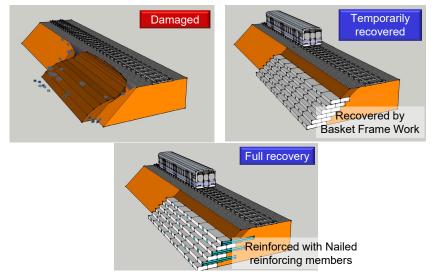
Example of step-by-step reinforced recovery of a damaged embankment
